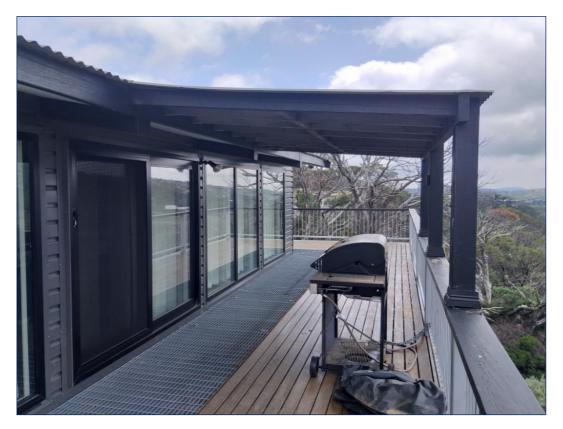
| Existing awning constructed on the external deck (Source: Department inspection)
